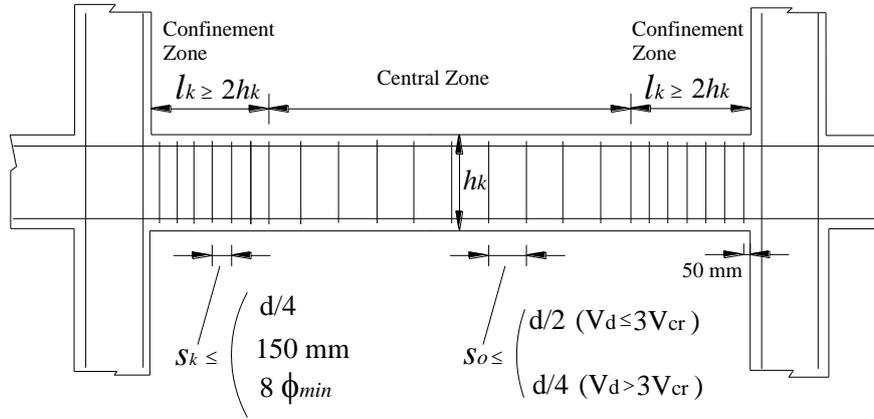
Transverse reinforcement requirements for beams of high ductility level
